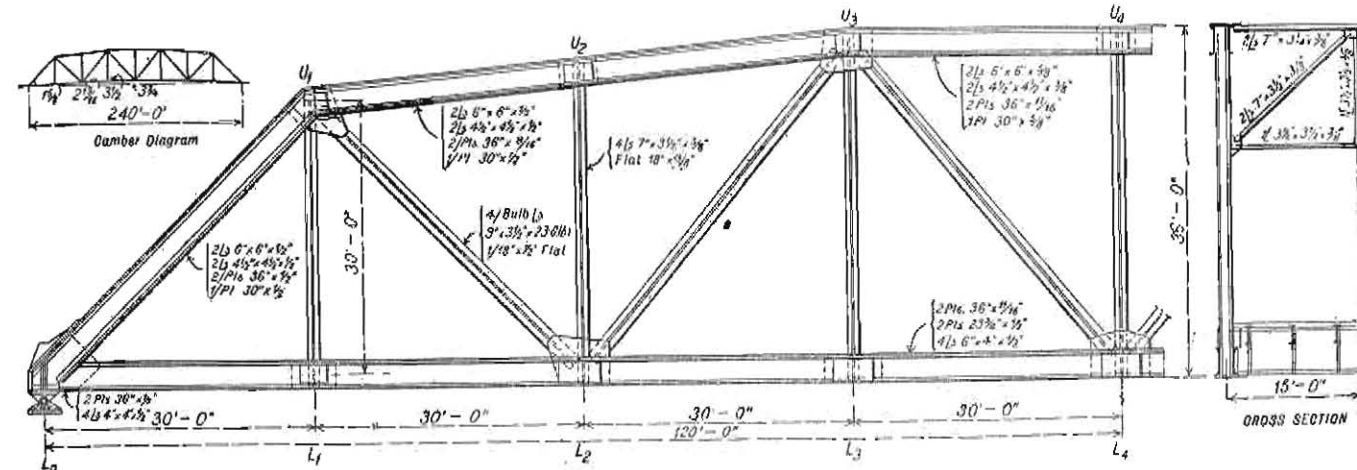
HALF ELEVATION AND SECTION OF FIXED SPAN.
